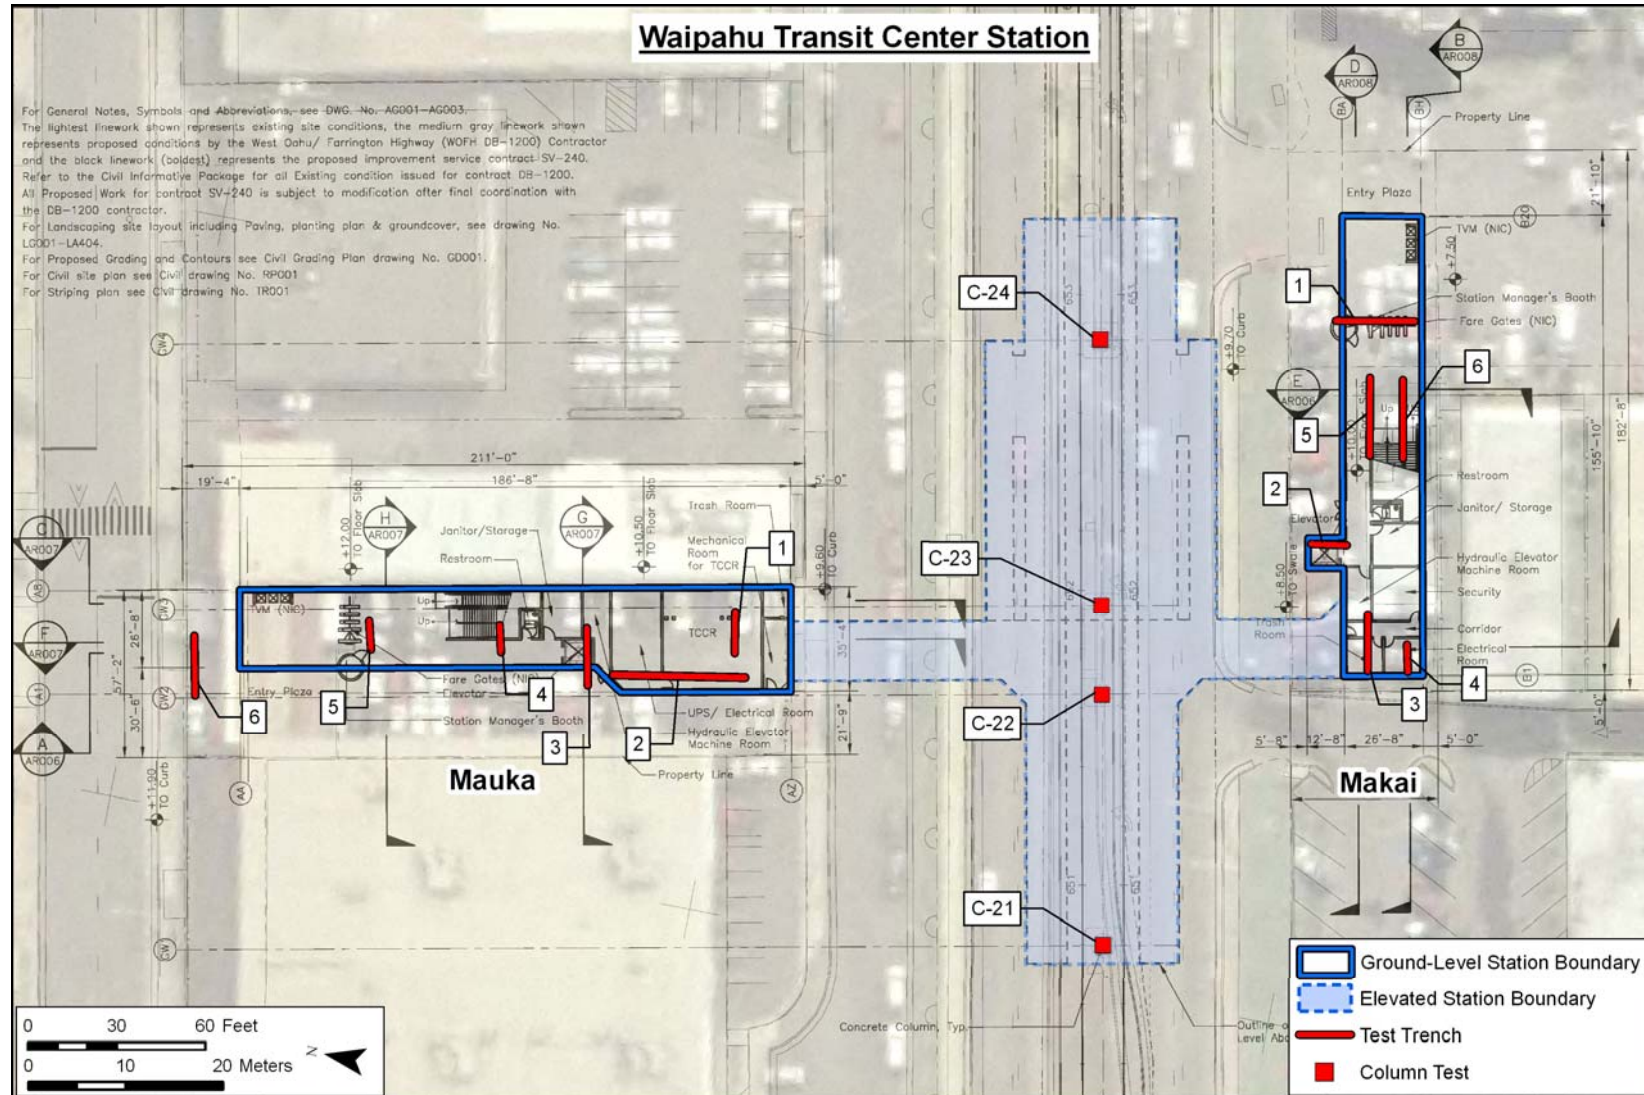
Waipahu Transit Center Station floor plan showing the location of test trenches
